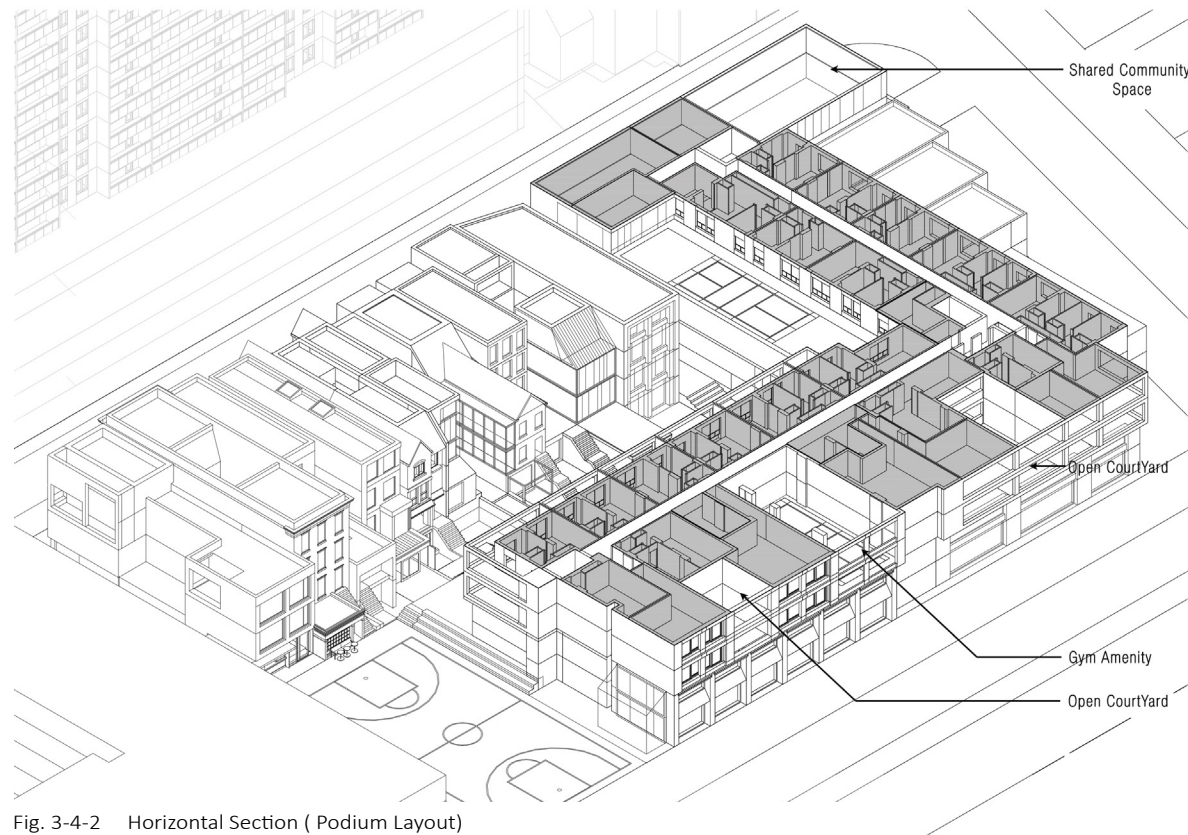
Horizontal Section ( Podium Layout)
